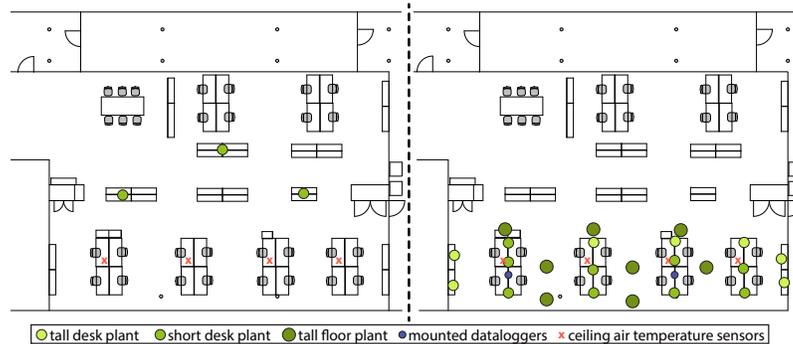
(a) E1 original layout (b) E1 experiment layout (with plants)
